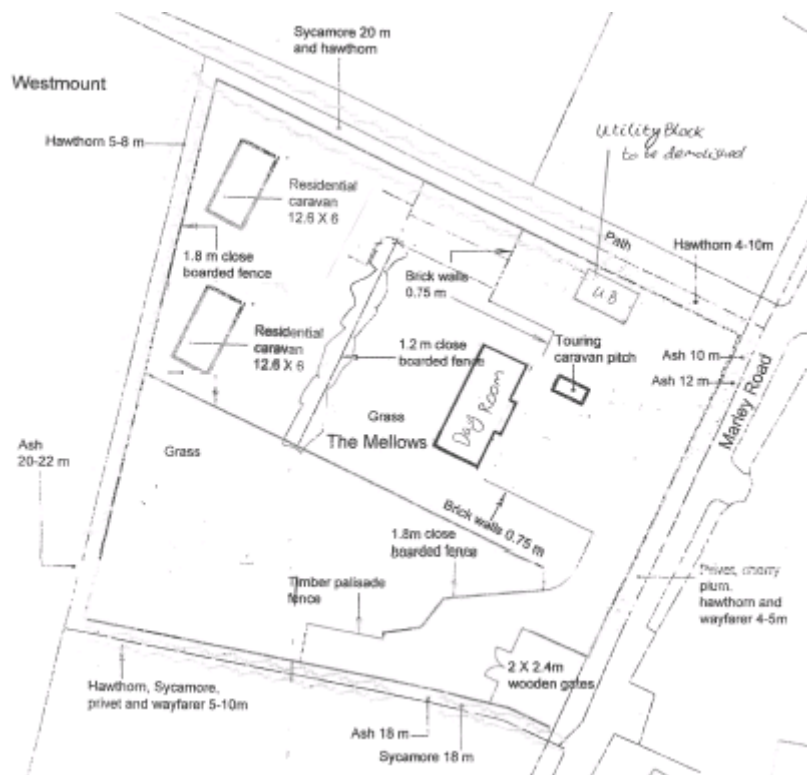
Block Plan of application 19/502352/FULL Retention of a dayroom, retention of re-sited mobile home, and the demolition of utility block. (Refused)
